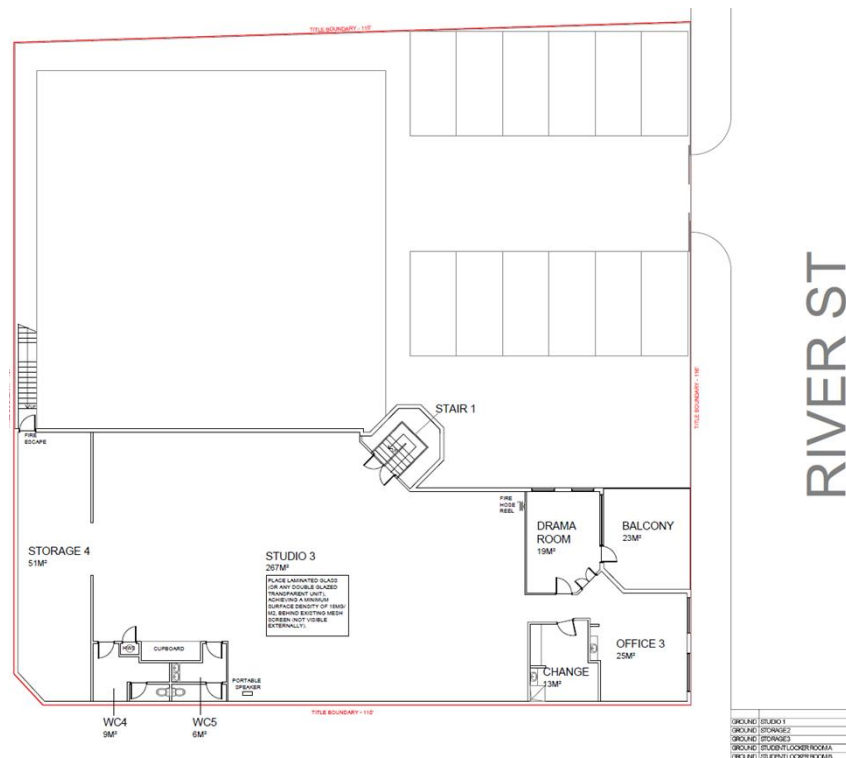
Proposed level 2 layout (Source: Decision Plans)
